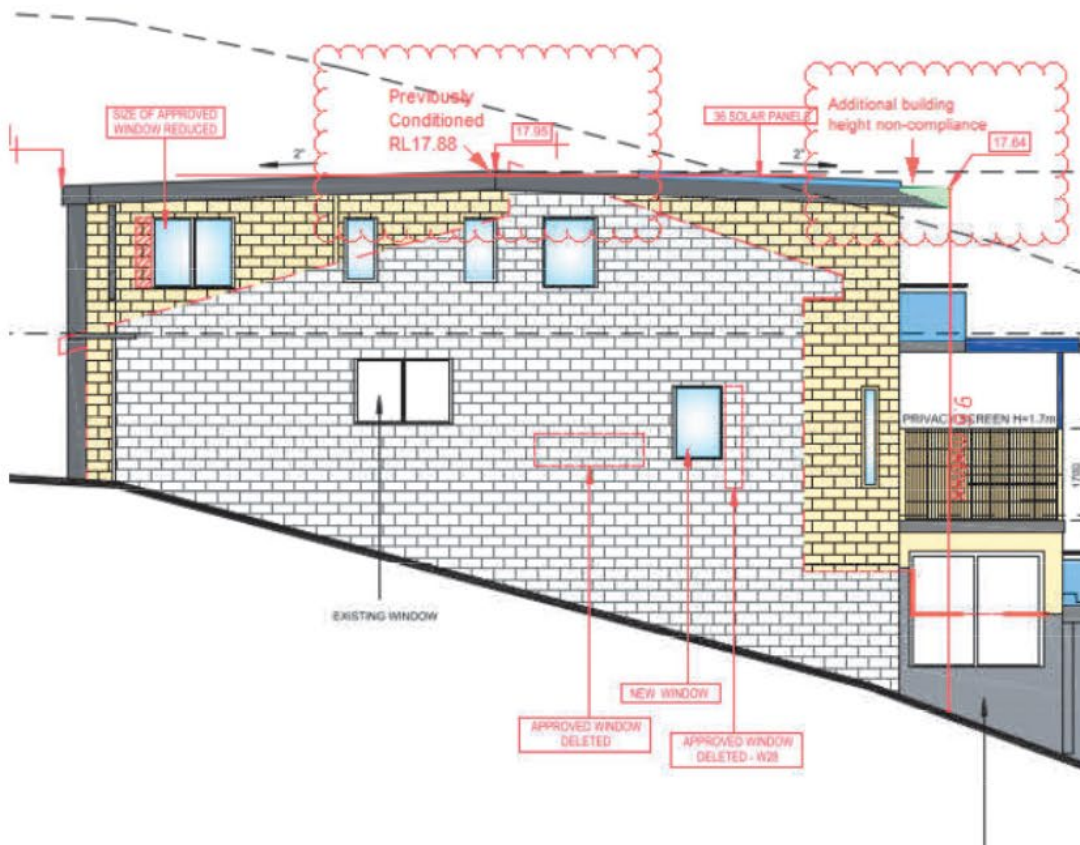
Additional Building Height in green (9.6m) and previously approved RL17.88 with modified RL17.95.
